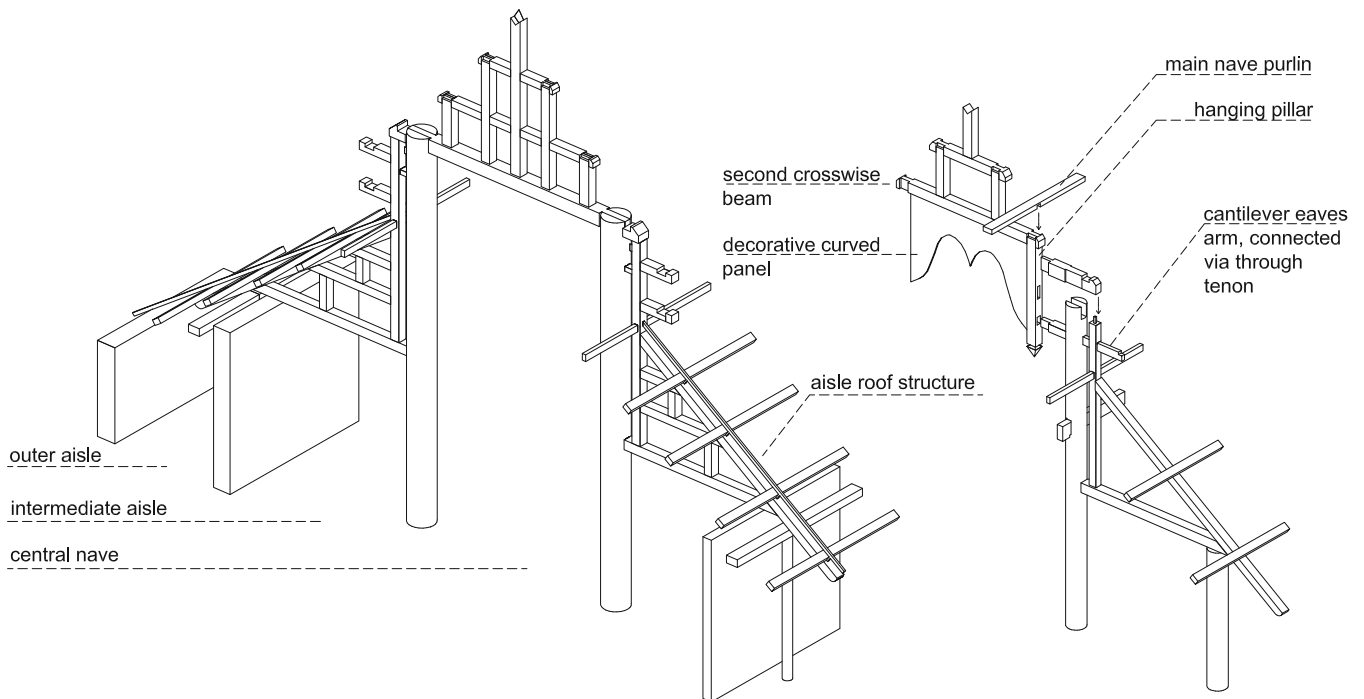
Transverse frame at the principal hall; carpenter halved three standing pillars of the nave roof structure to two levels of crosswise beams
